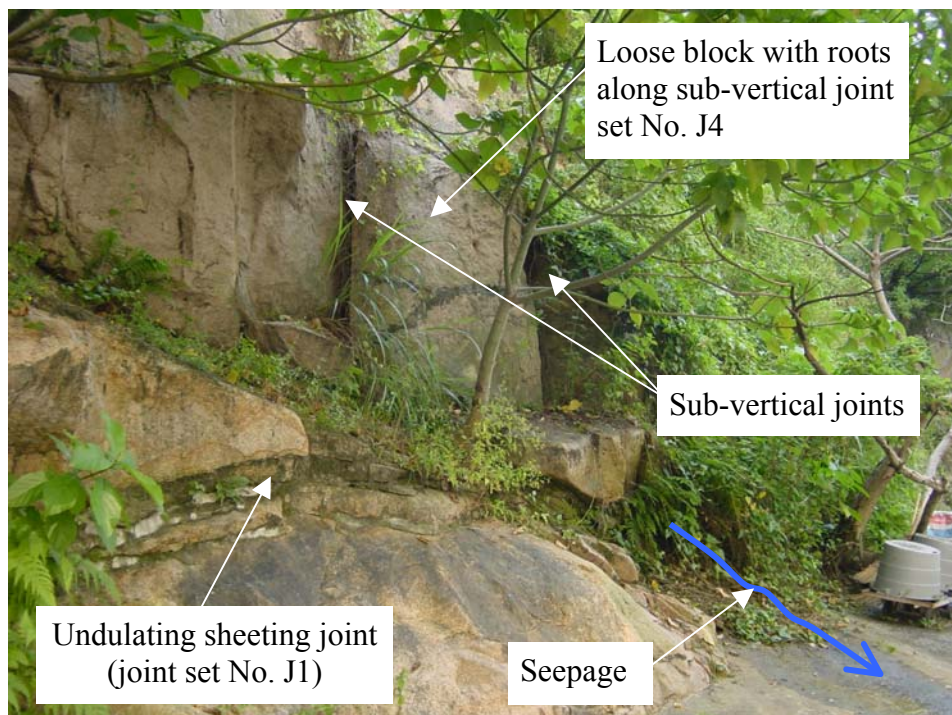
Seepage Observed at Intersection of Sheeting Joint (Joint Set No. J1)
